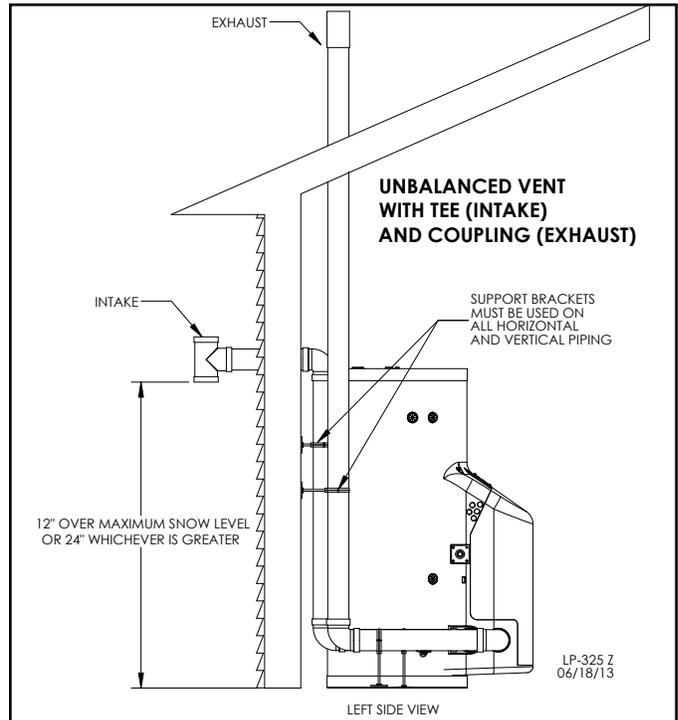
Unbalanced Venting - Roof Exhaust and Sidewall Intake
